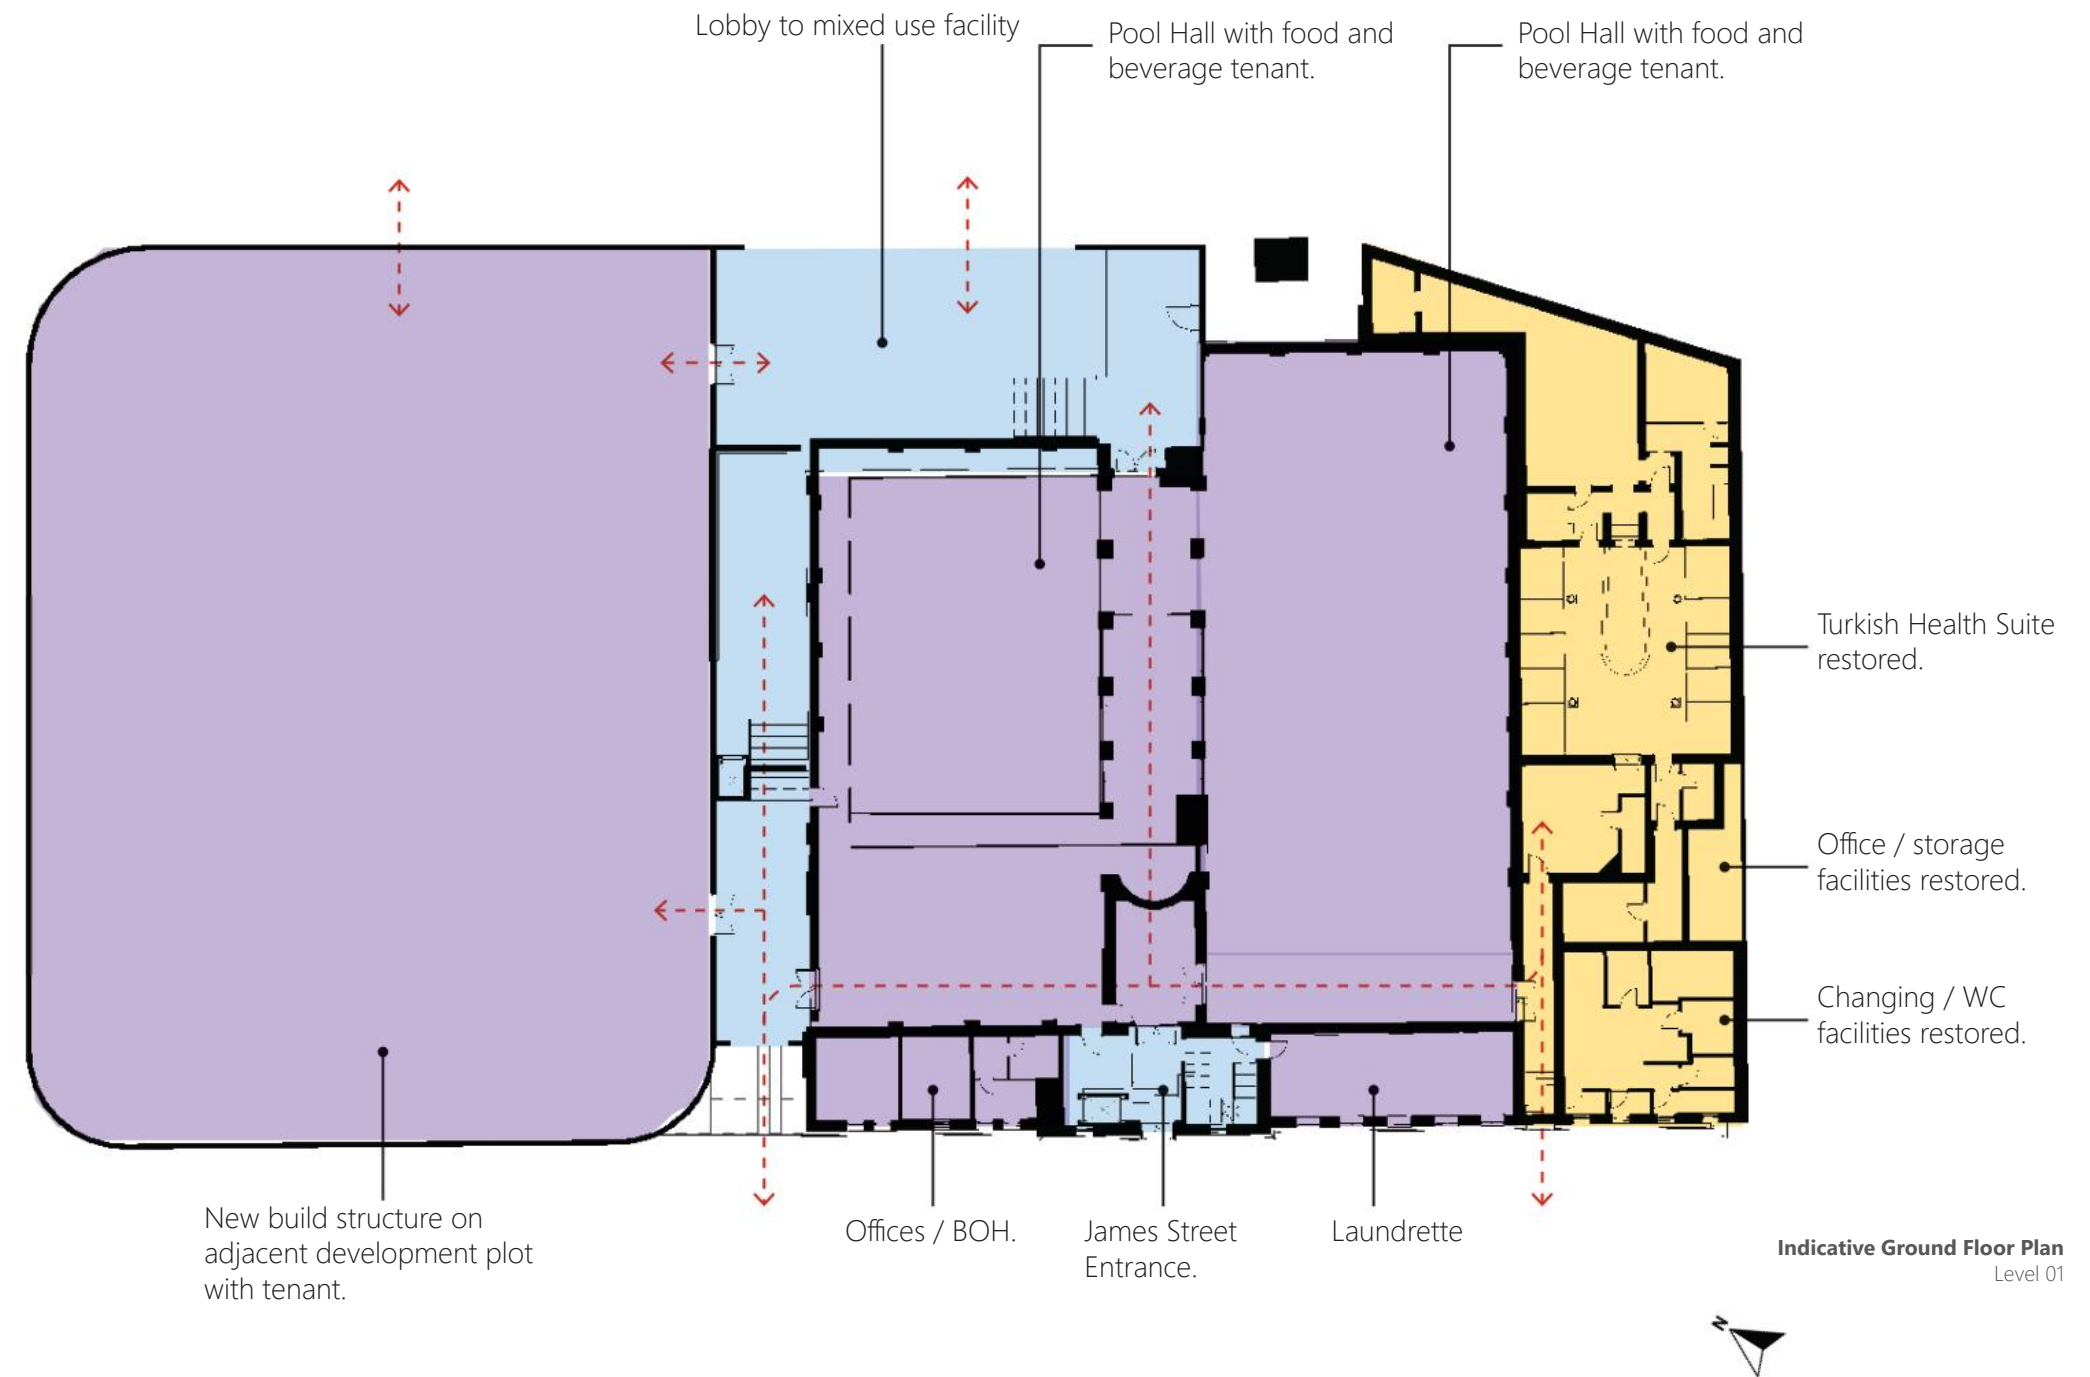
Ground Floor Plan, option 3, indicative use layout as proposed Level 00
